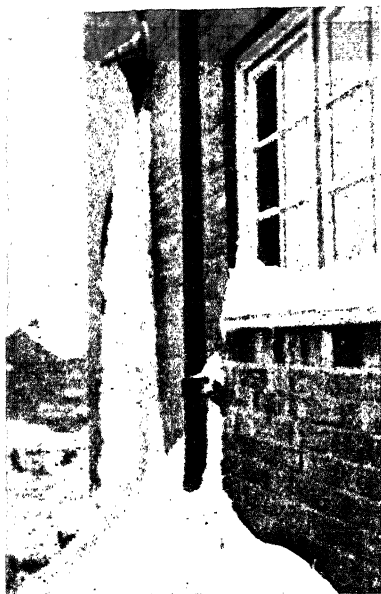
ICE ON PIPE DUE TO DRIP THROUGH WASTE OUTLET
